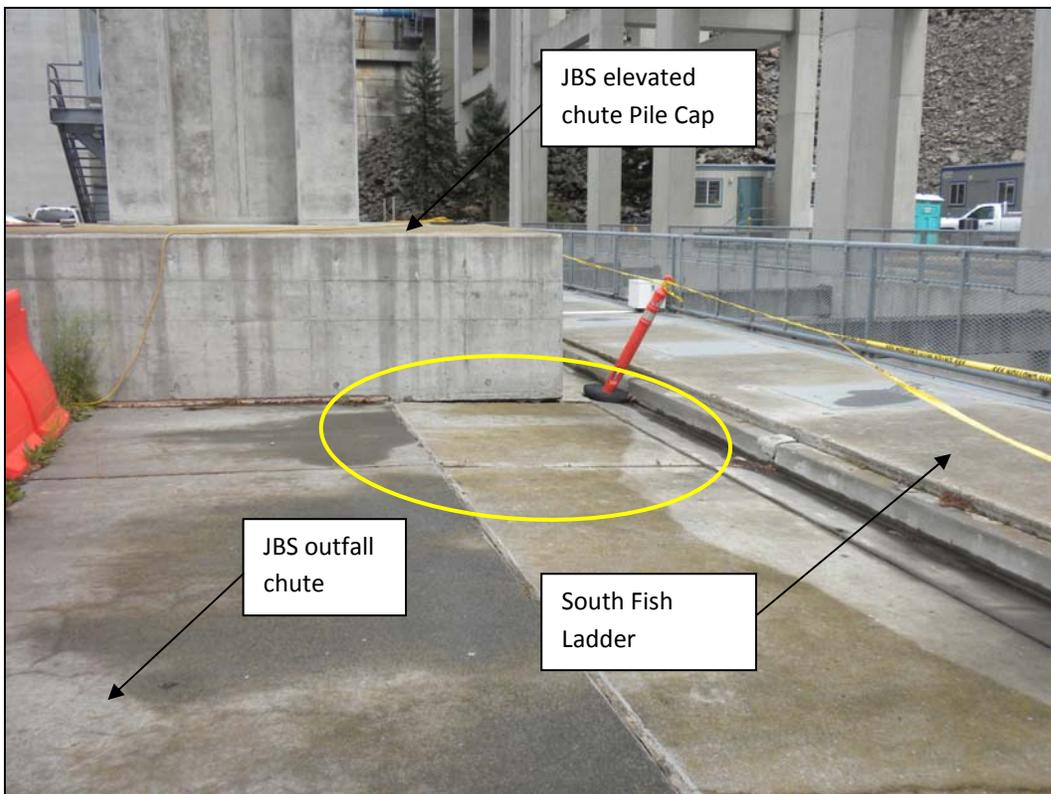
South Fish Ladder Section 10 showing subsidence area and drummy concrete
